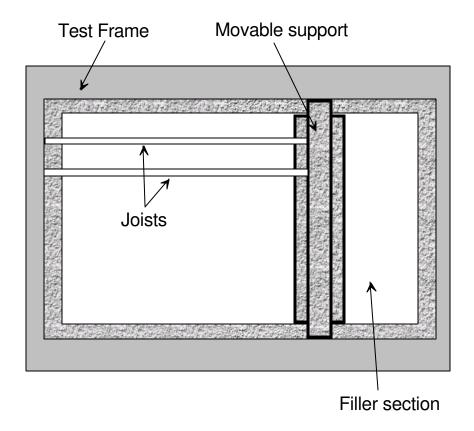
Illustration of the use of the movable concrete support when testing floors with different joist lengths.
